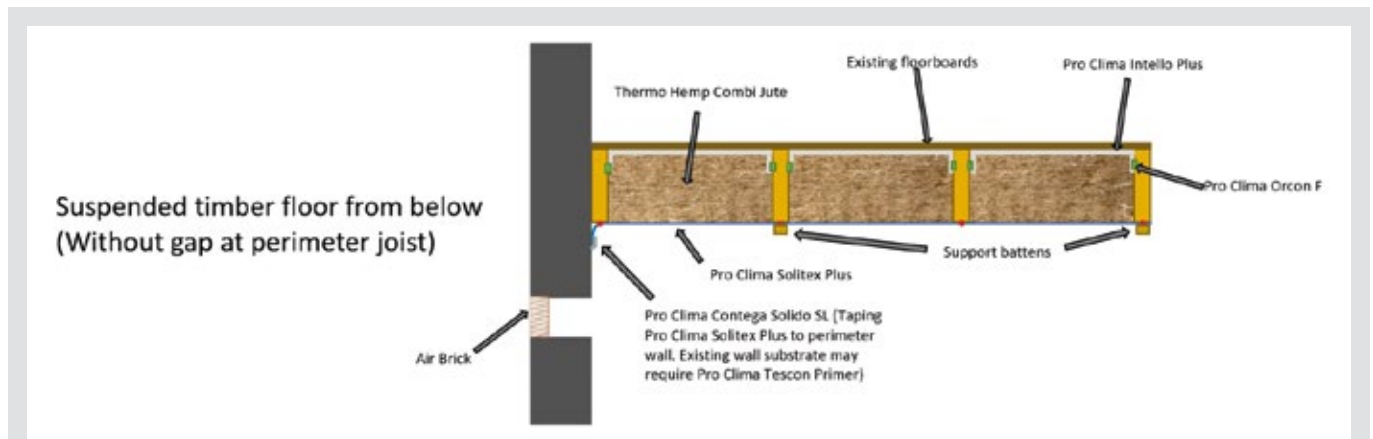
Suspended timber floor without gap at perimeter wall
